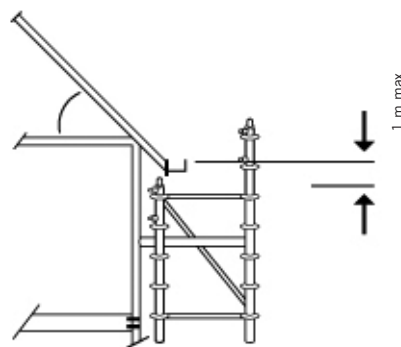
Scaffolding as edge protection for roofs greater than 35 degrees pitch (end guardrail omitted for clarity).
